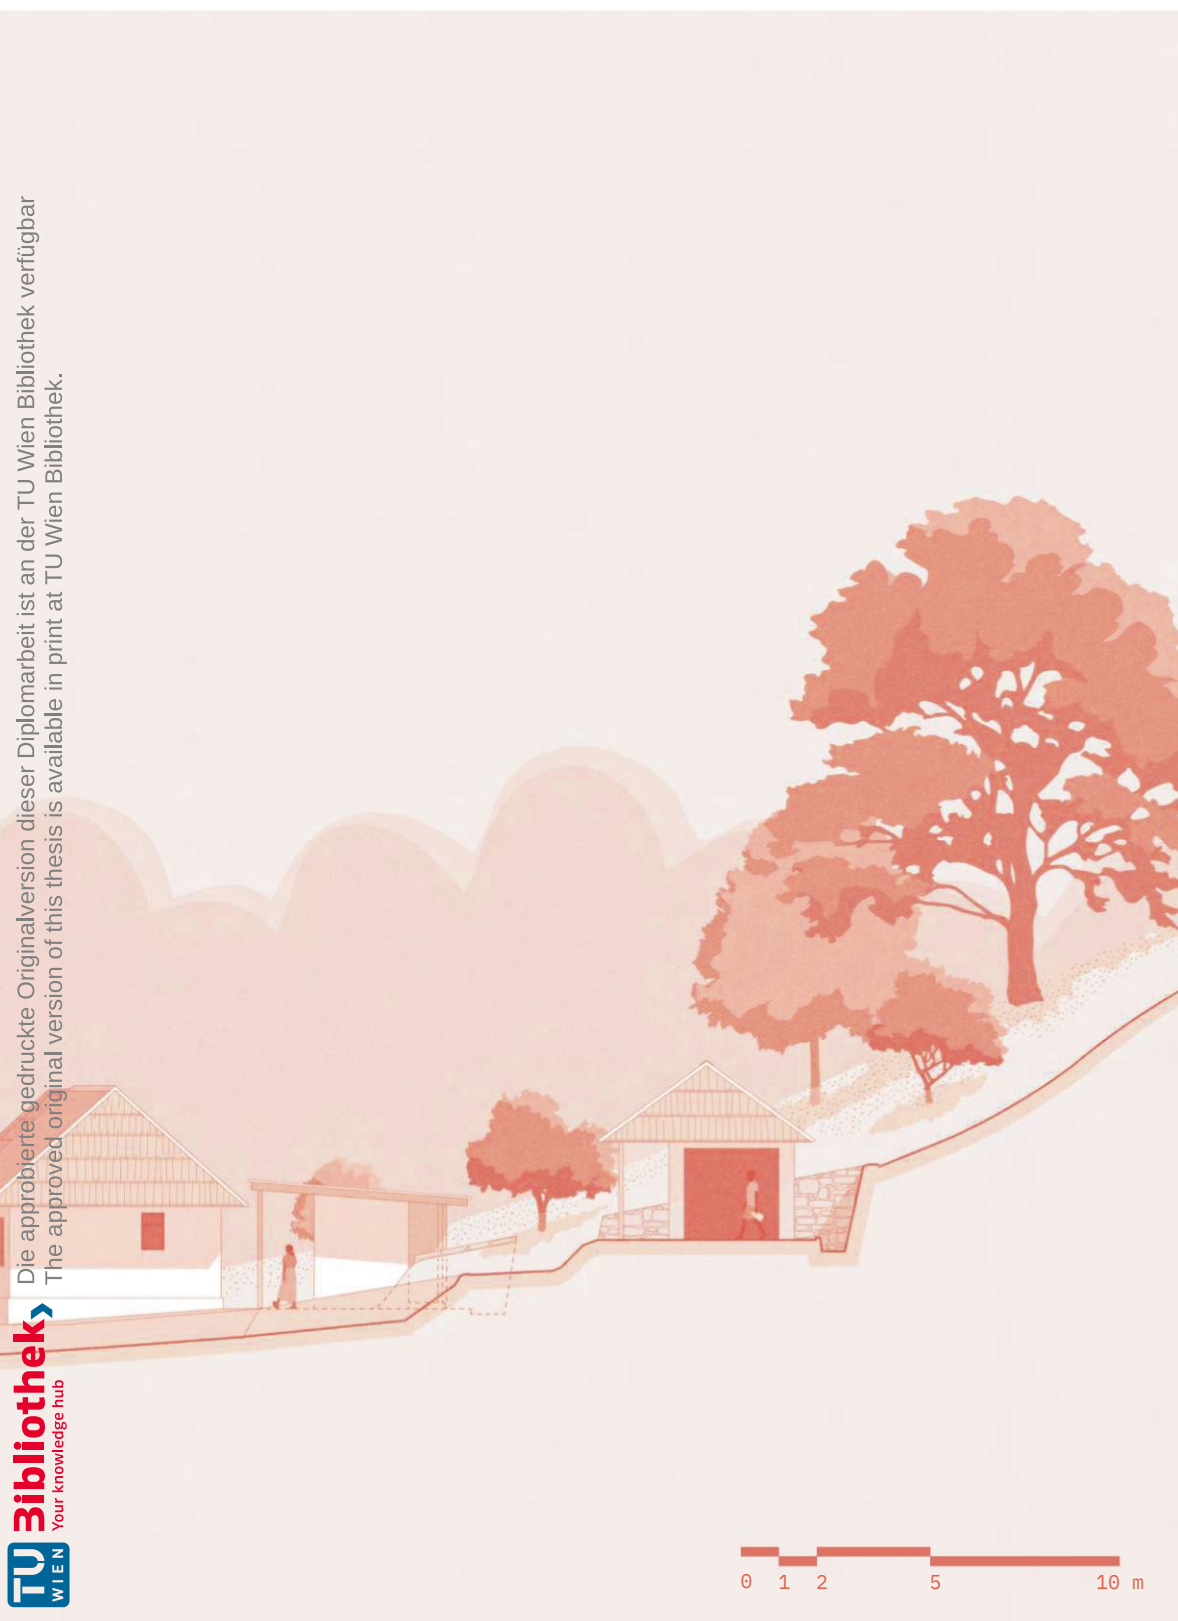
Section / elevation west (BB), 1:200. From left to right: fields, kitchen garden, residential buildings.
